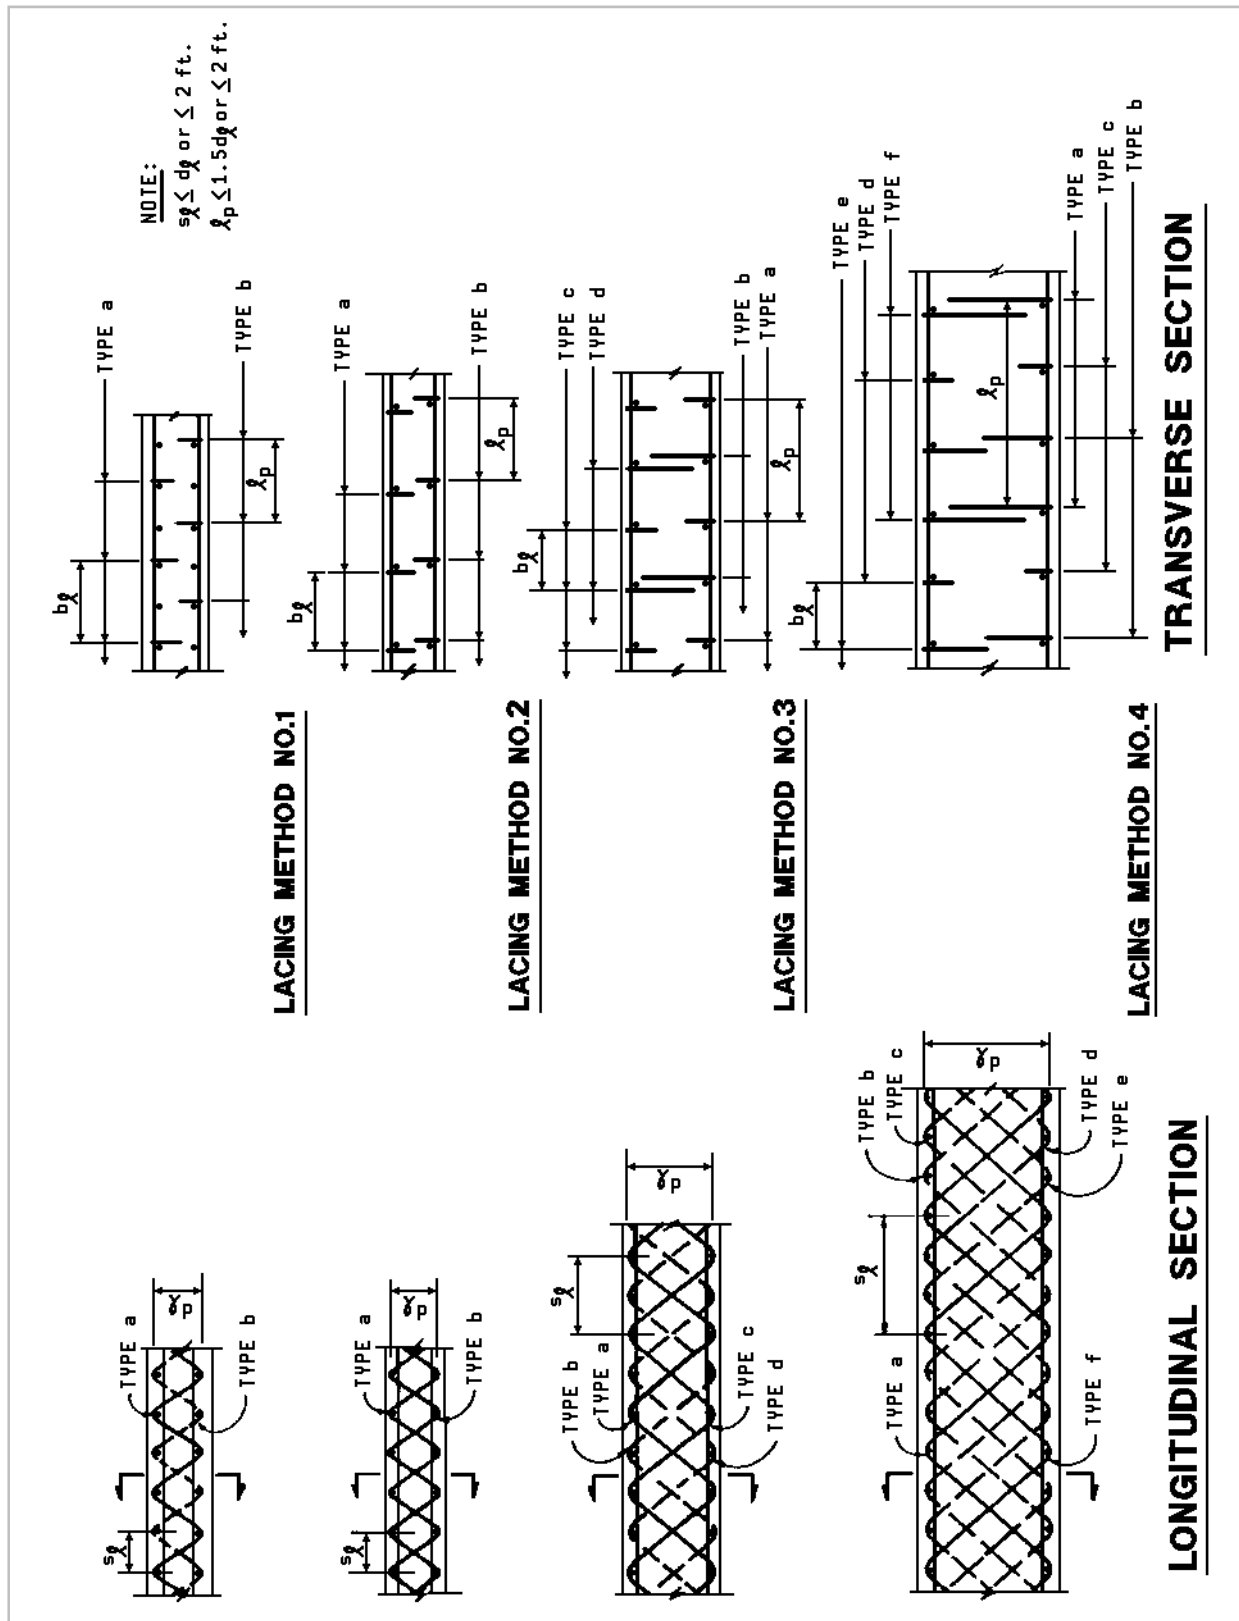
Typical Location of Continuous and Discontinuous Lacing
